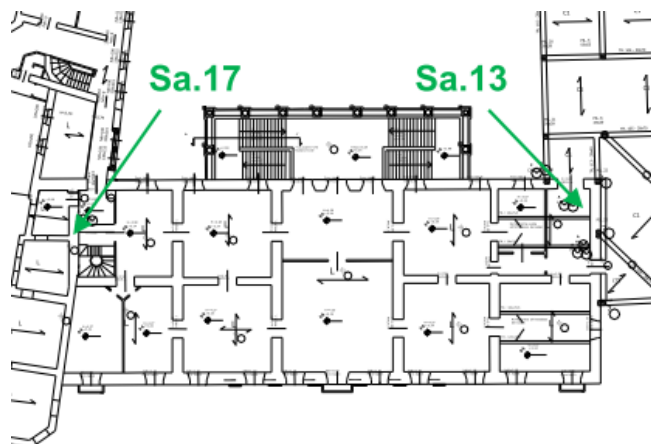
Location of plaster removal (Sa) at the first floor of building A.
